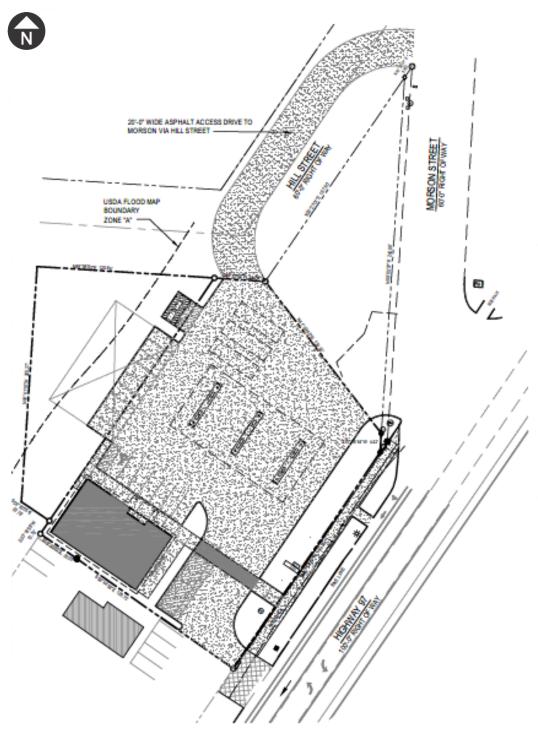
Proposed site access plan. Source: Wayward R Studio, Dated June 3, 2024.
